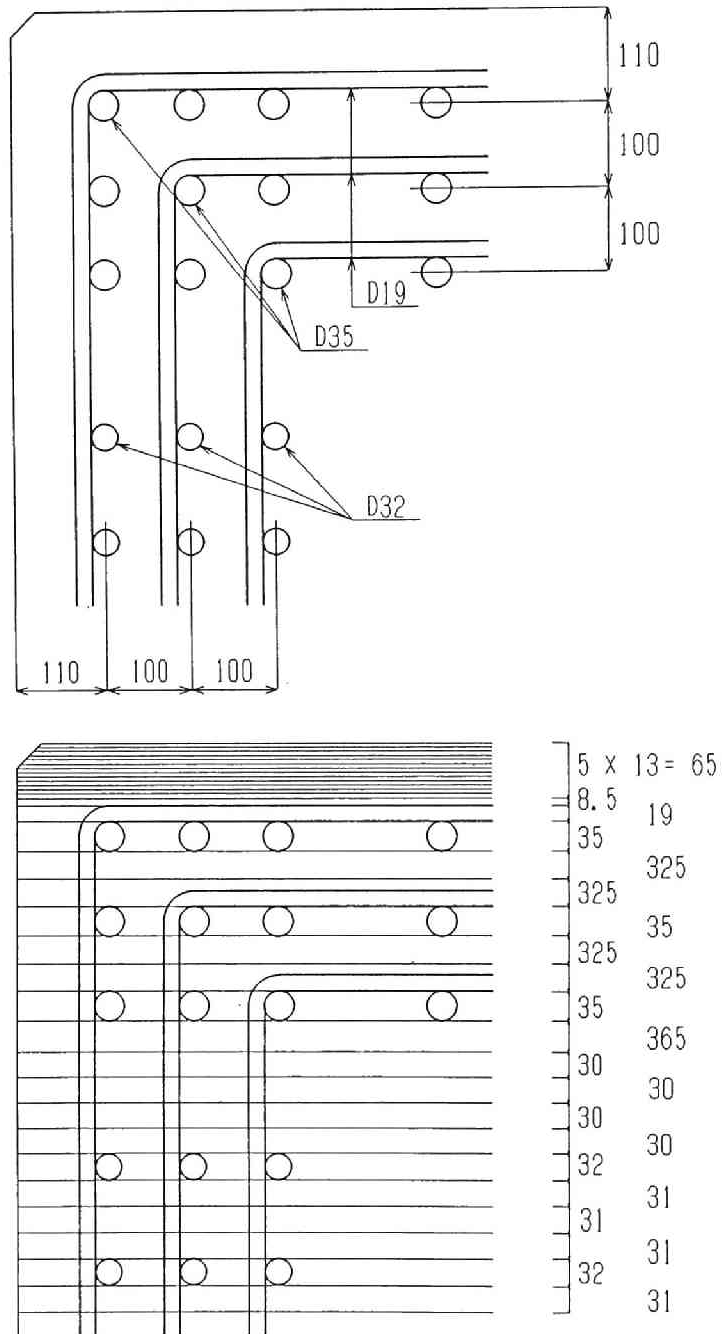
(a) Discrete fiber elements for a cross section of the pier below the termination point of the reinforcing bars.
